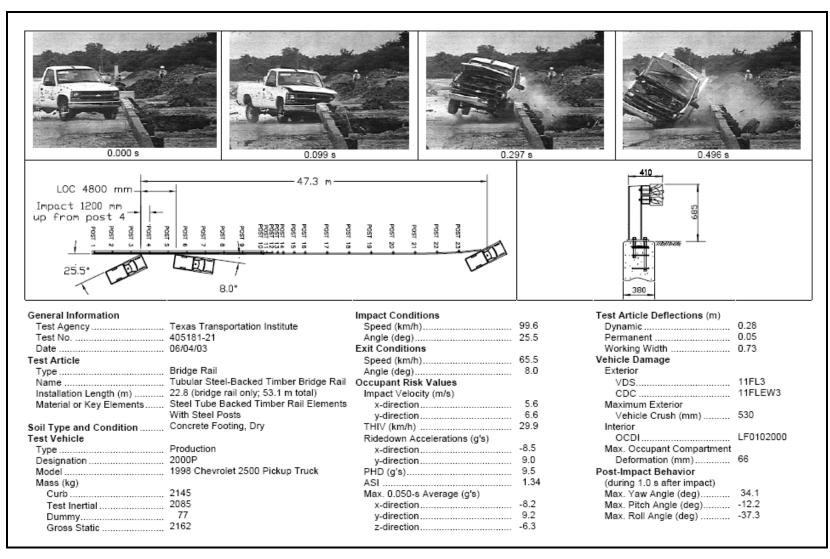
Tubular Steel-Backed Timber Bridge Rail
